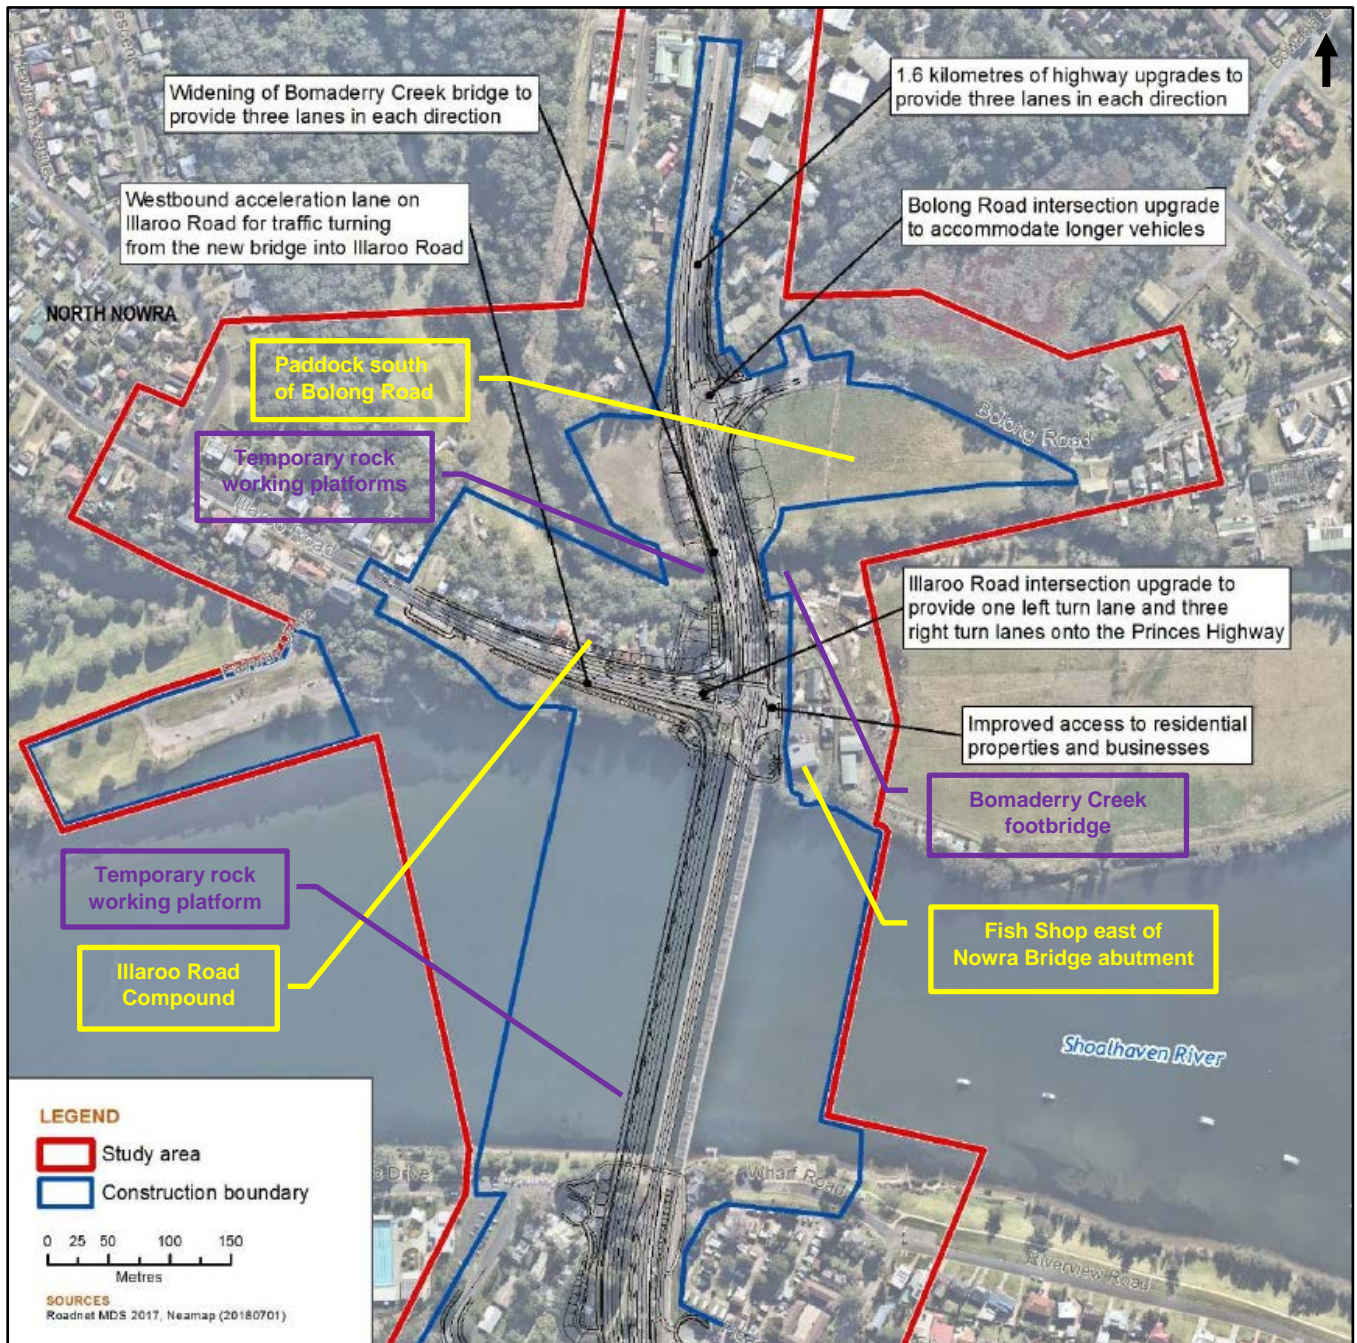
Location of ancillary sites (yellow), temporary rock working platforms and the Bomaderry Creek footbridge (purple) (Source: Roads and Maritime, 2019).
